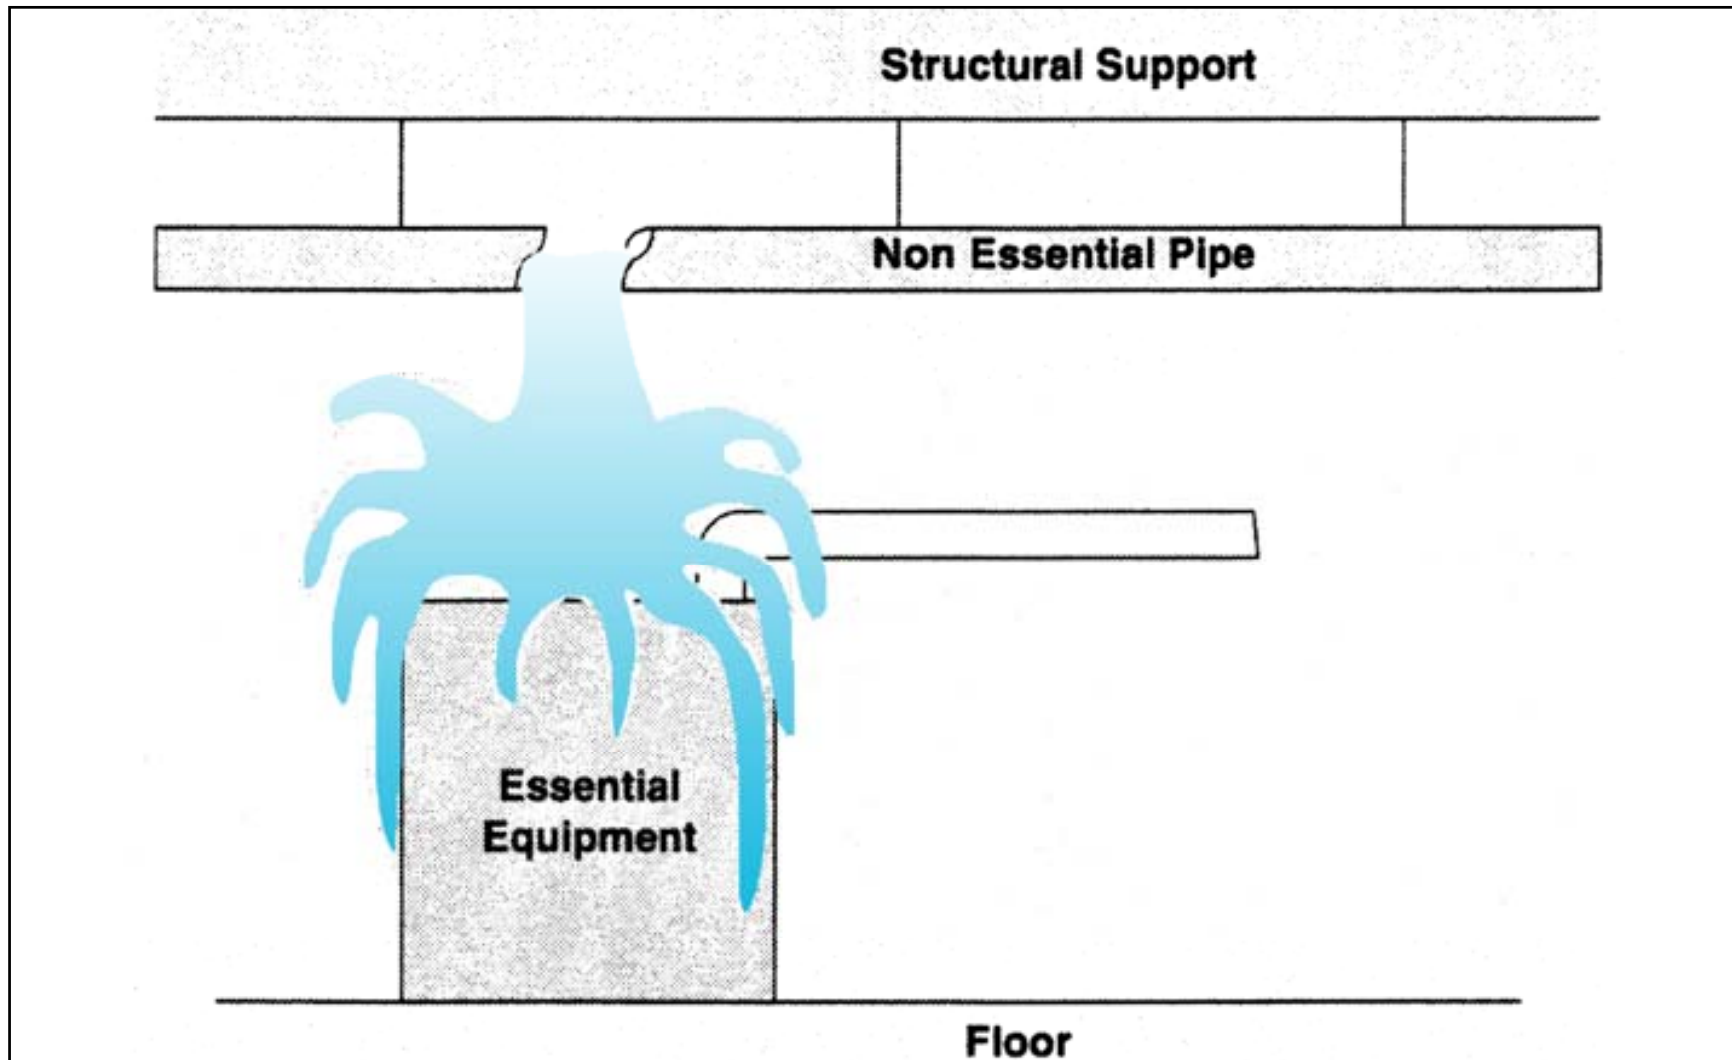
The failure of nonessential equipment, pipe, or duct can cause the failure of essential equipment.
